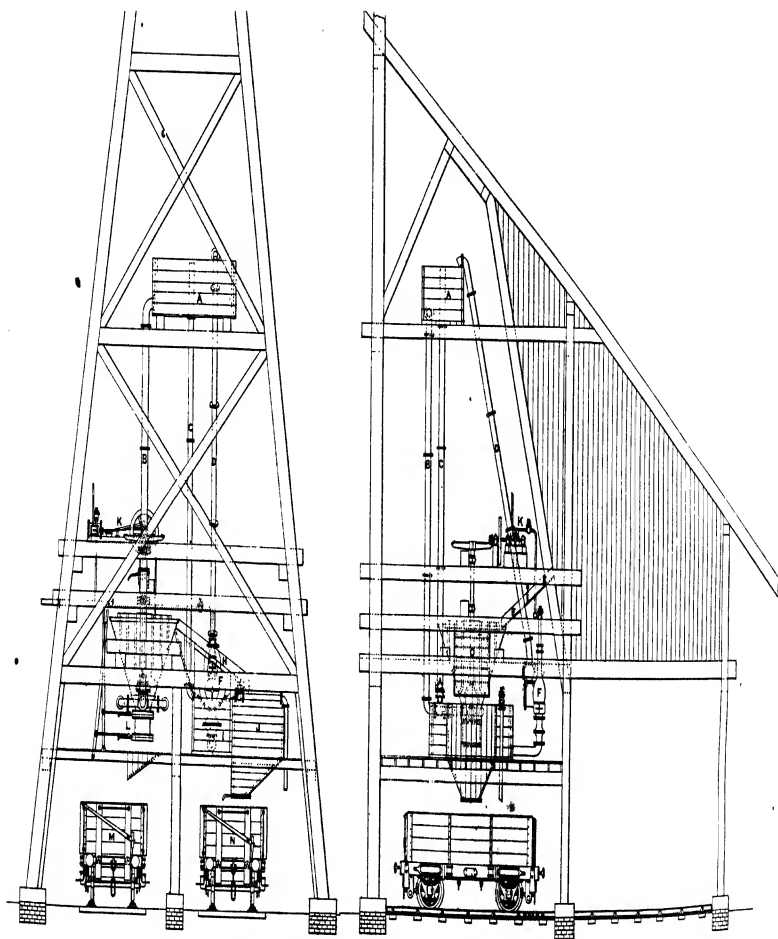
Arrangement of Robinson washing plant. End and side elevations.
